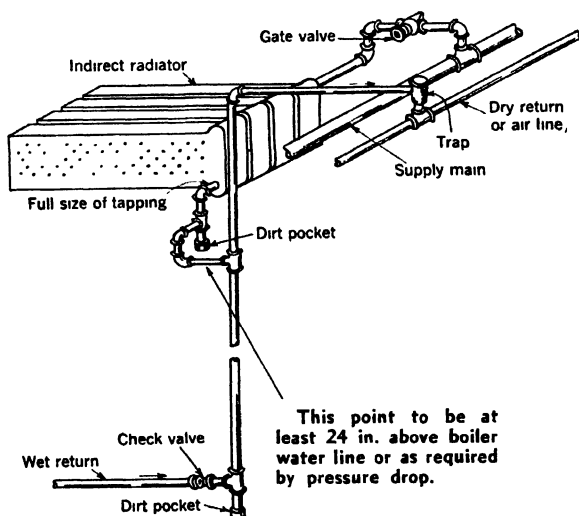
TYPICAL PIPING CONNECTIONS TO CONCEALED HEATING UNITS WITH WET RETURNS
